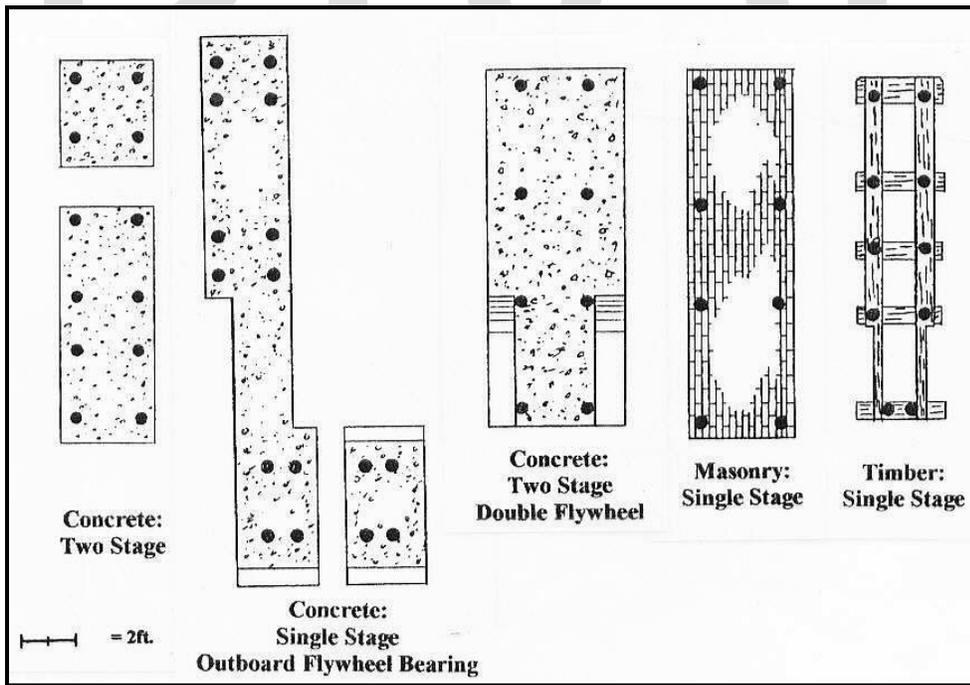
The plan view depicts foundations for straight-line compressors. Source: Twitty, 2002:145.
